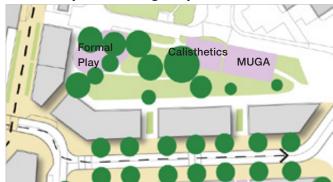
Jubilee Gardens plan - children's and youth play space
